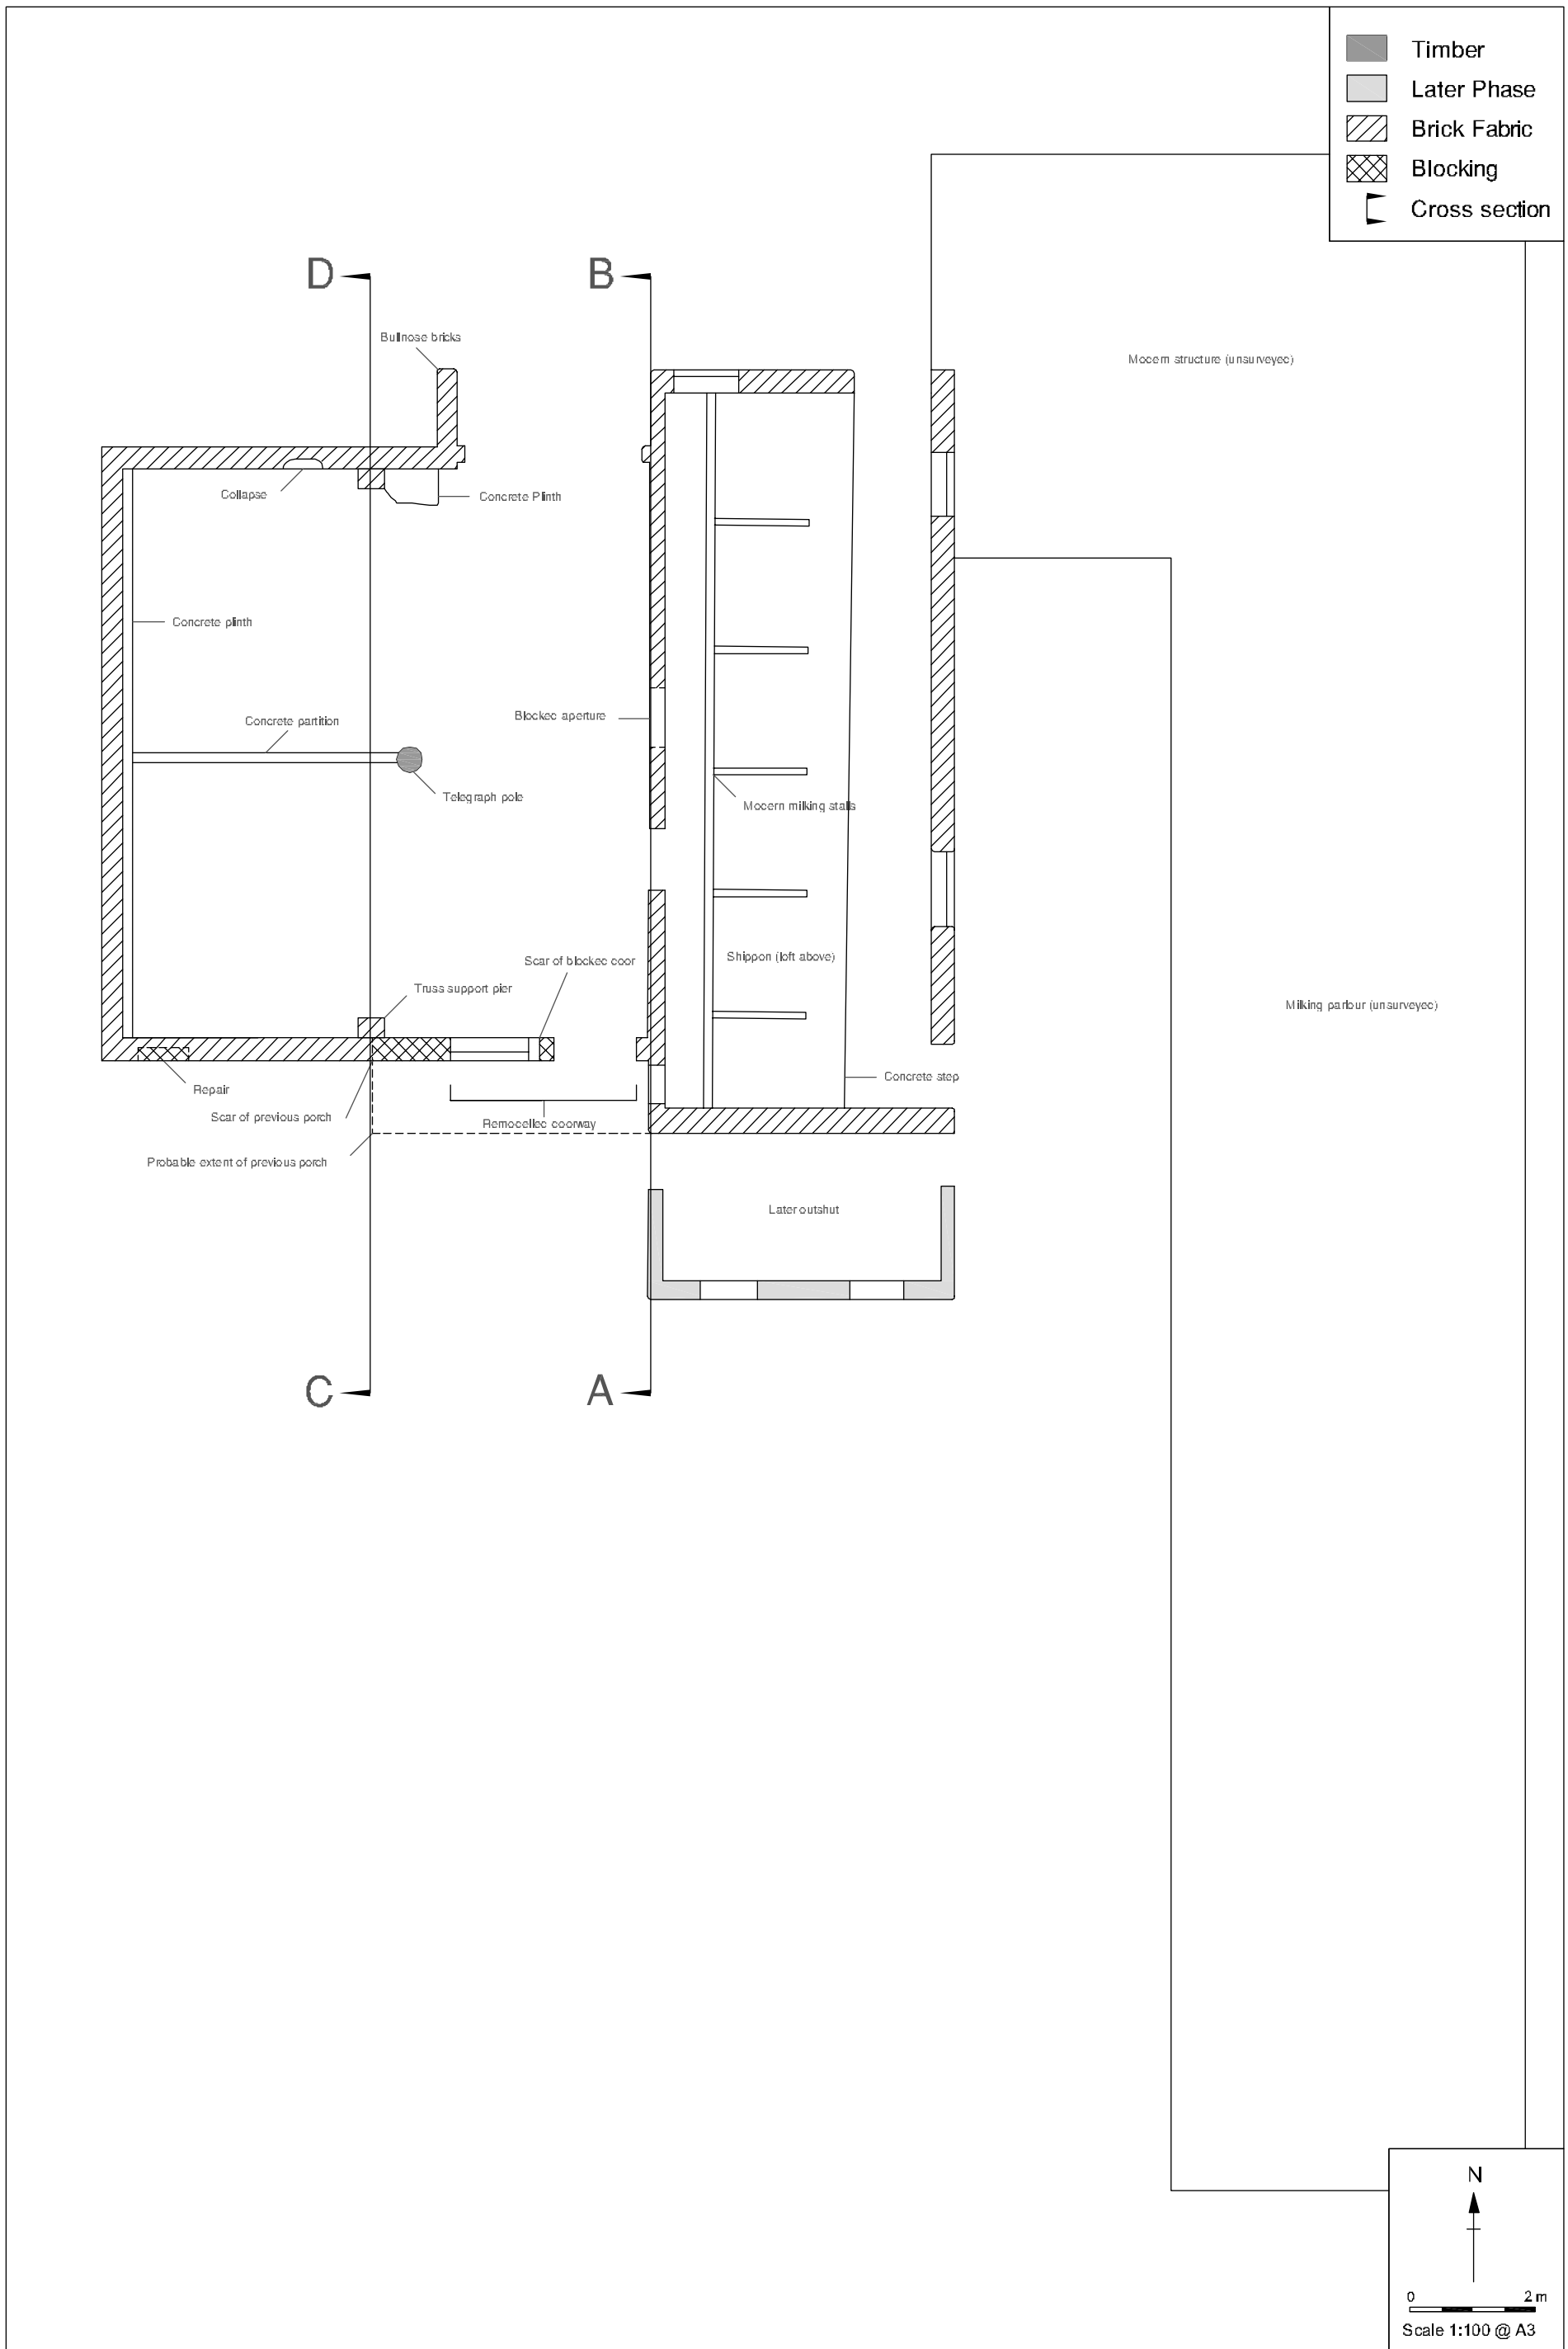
Ground floor plan of the barn at Hankinson's Farm
